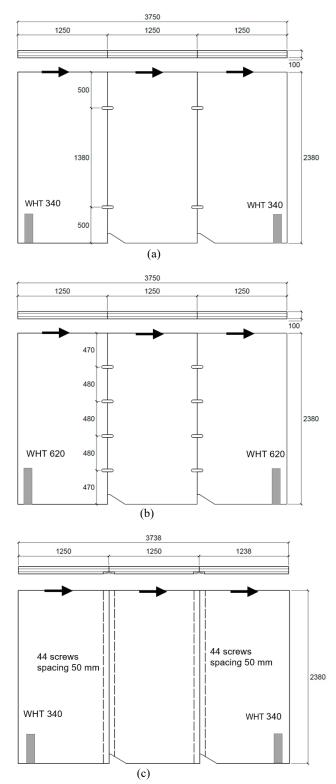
Shear-wall test specimens (a) Wall-II, (b) Wall-II, (c) Wall-III
